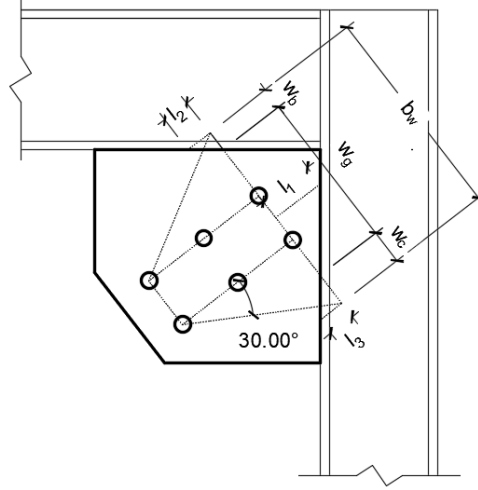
Whitmore Widths Occurring in Beam, Gusset, and Column.
